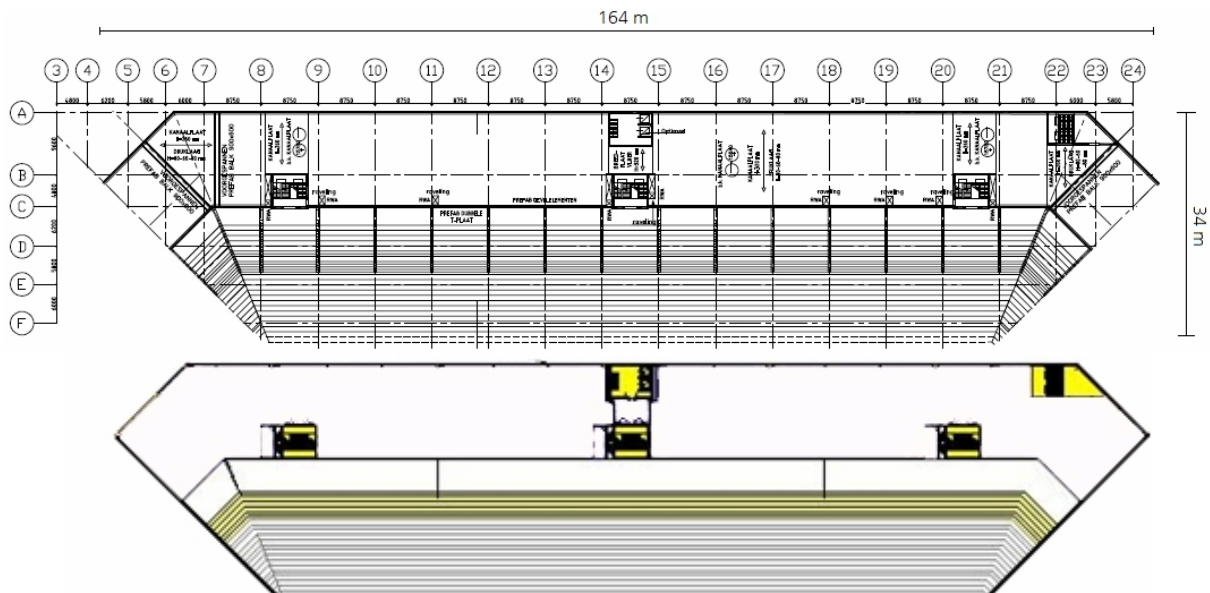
Structural and functional plan for the 2<sup>nd</sup> floor
